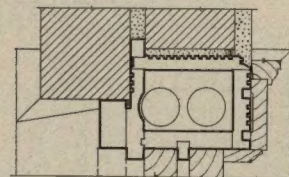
Using narrower jamb width for 8-inch brick or tile wall with plaster on masonry. Note position of anchor strip to give narrower jamb width.
